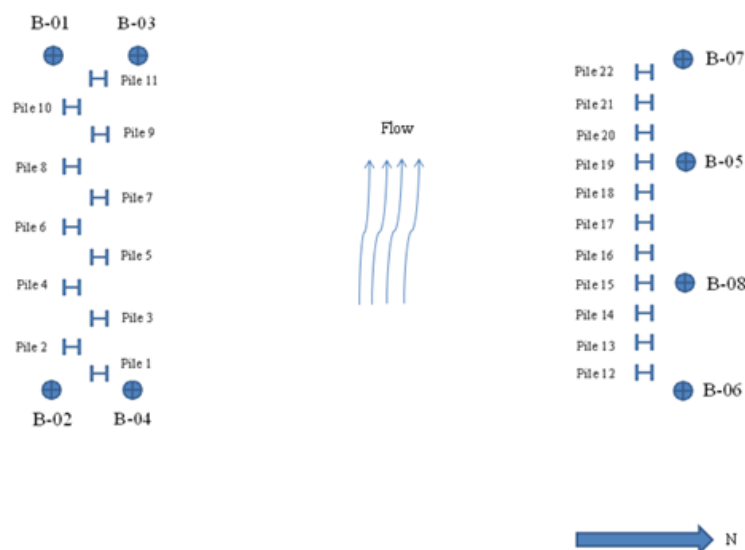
Foundation Configuration and Locations of Boreholes of Bridge No. 7480
